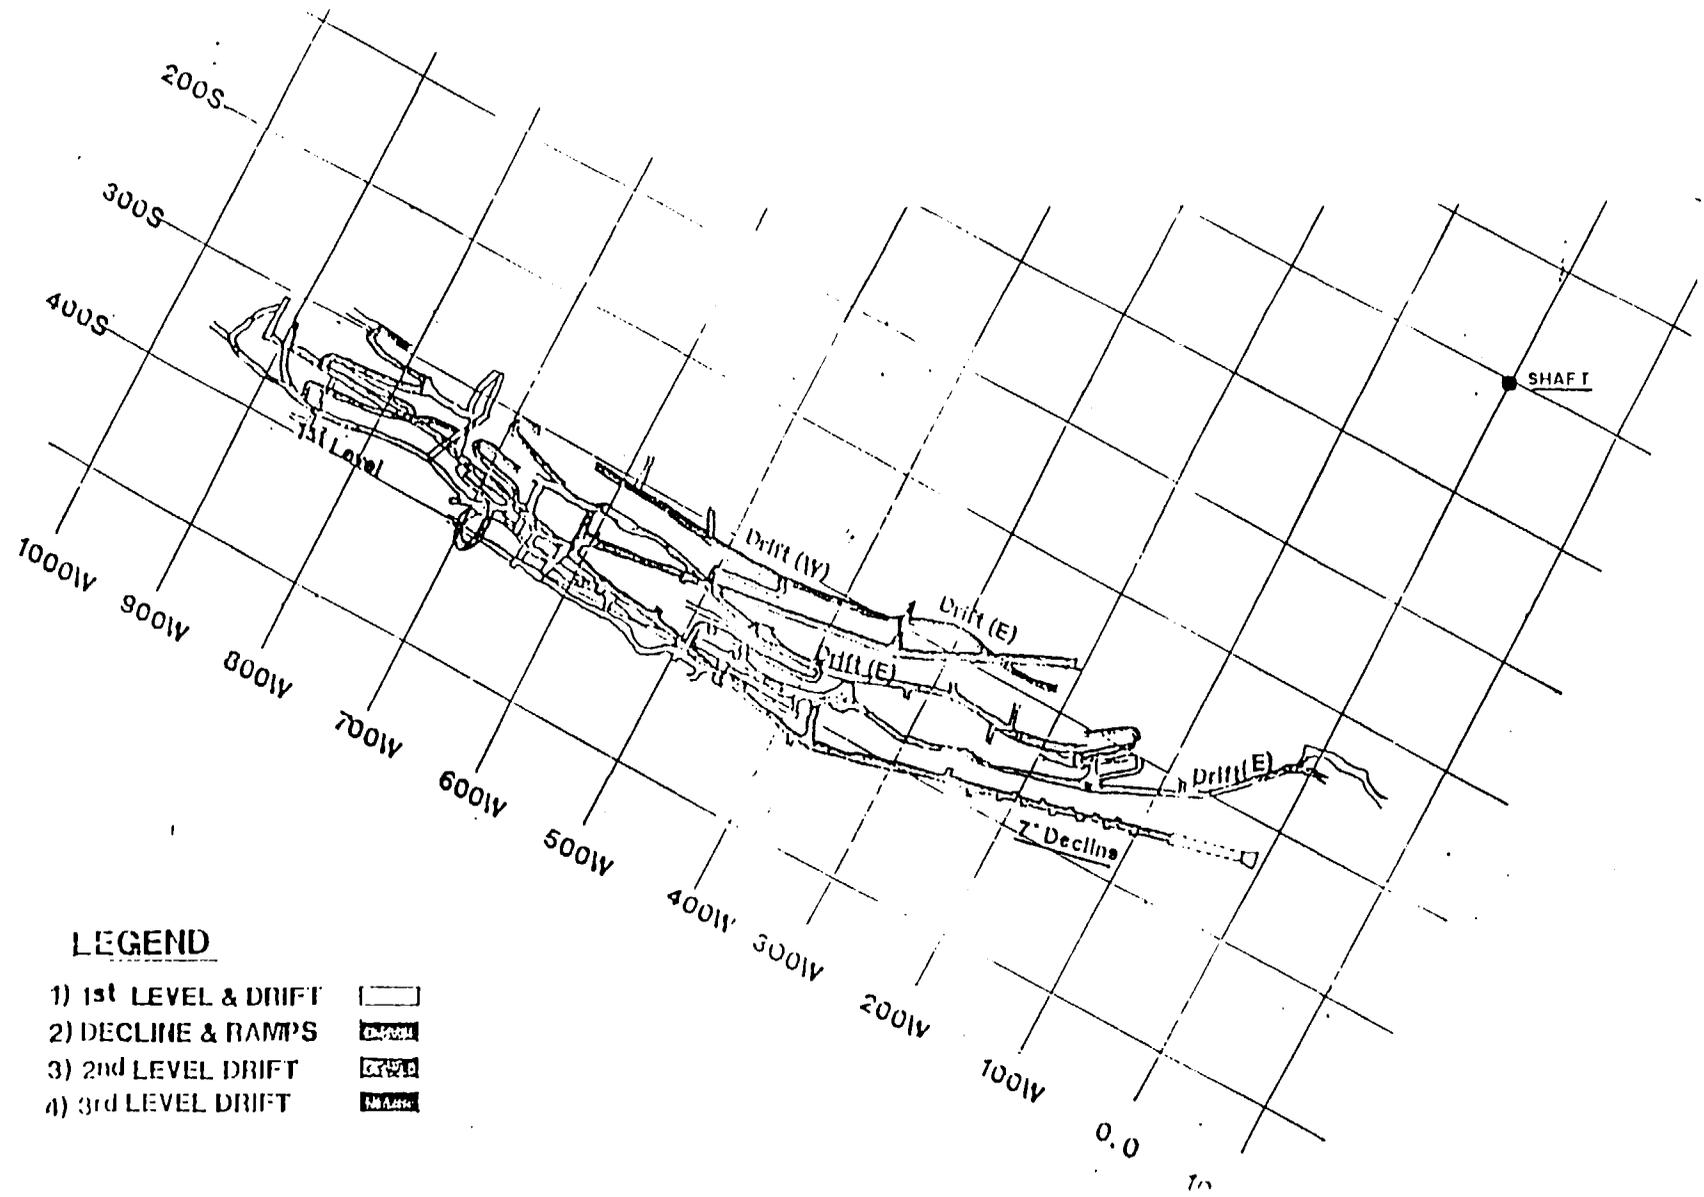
Narwapahar mining project; underground plan showing present development through decline.
